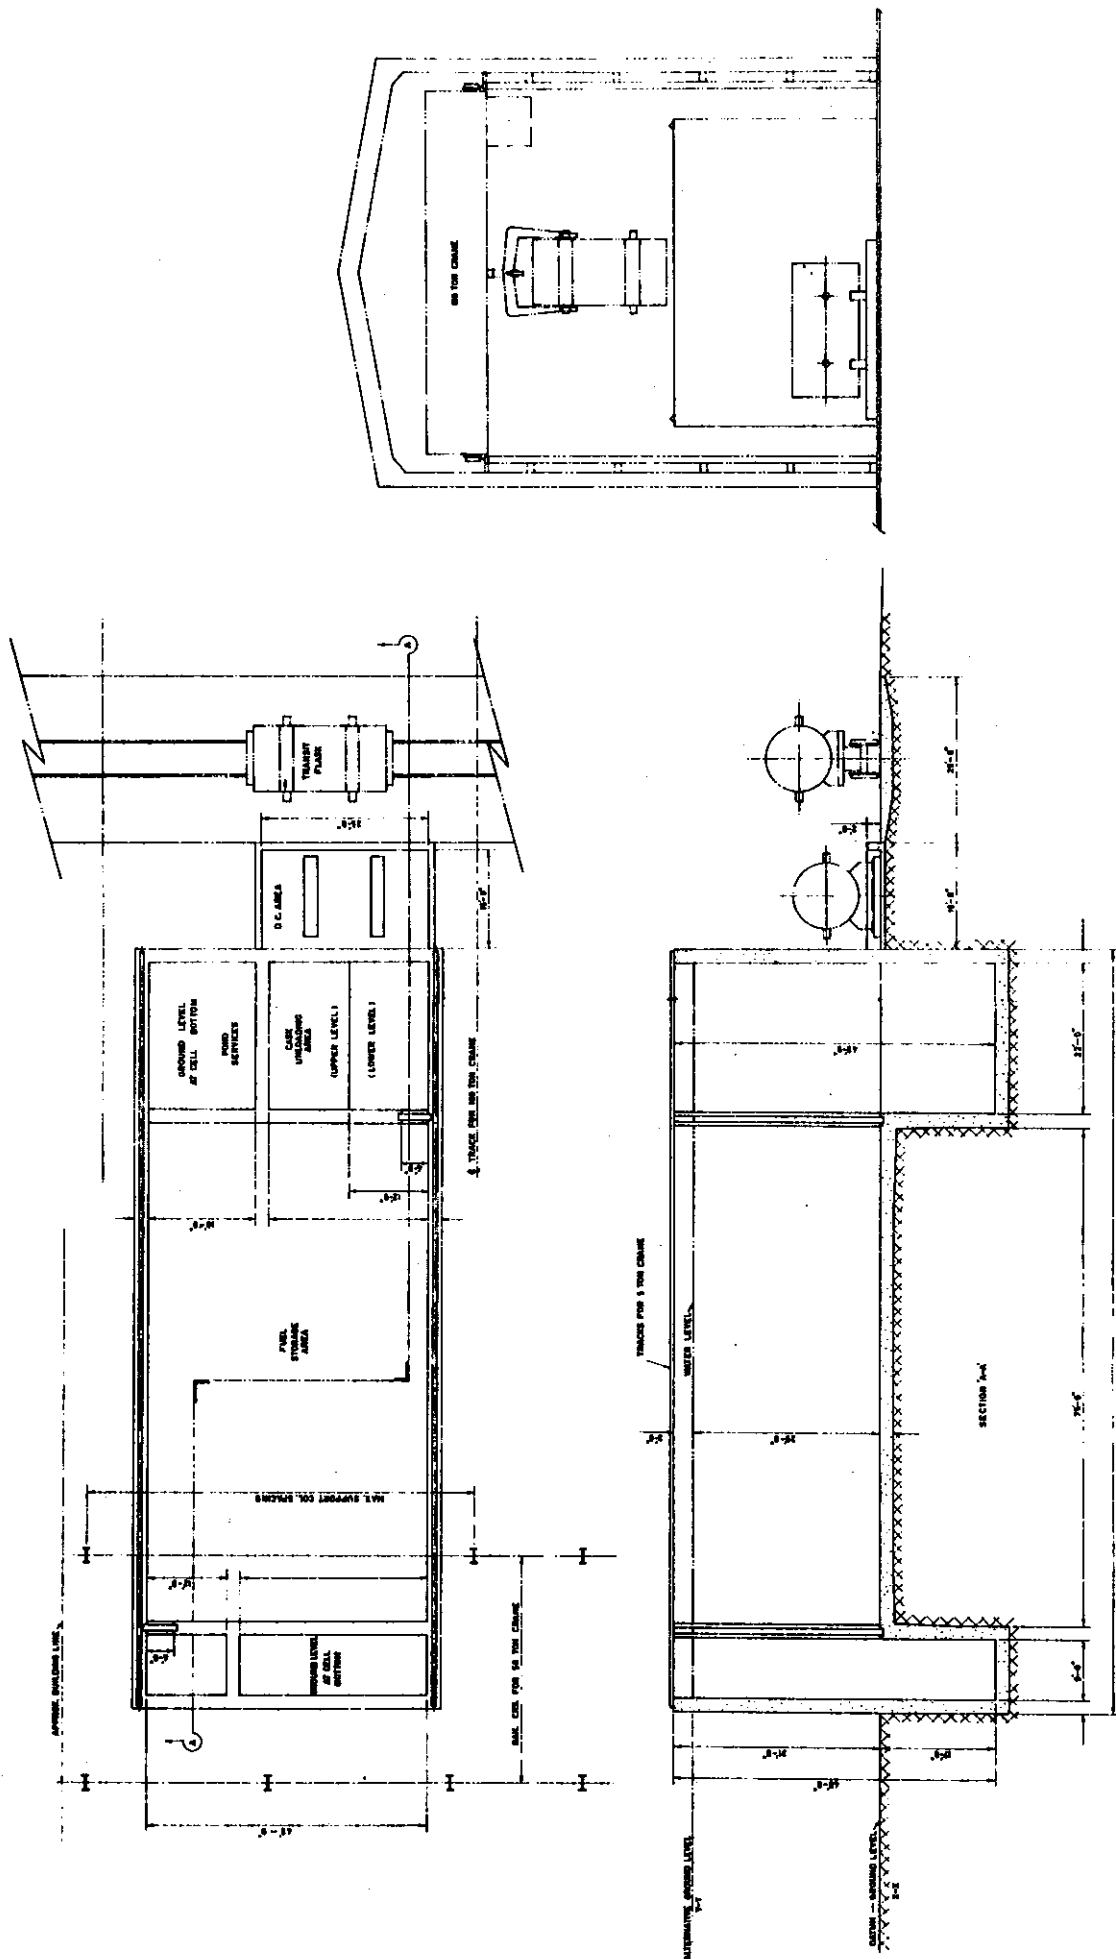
BUILDING DESIGN - CRANE SUPPORTING BUILDING
